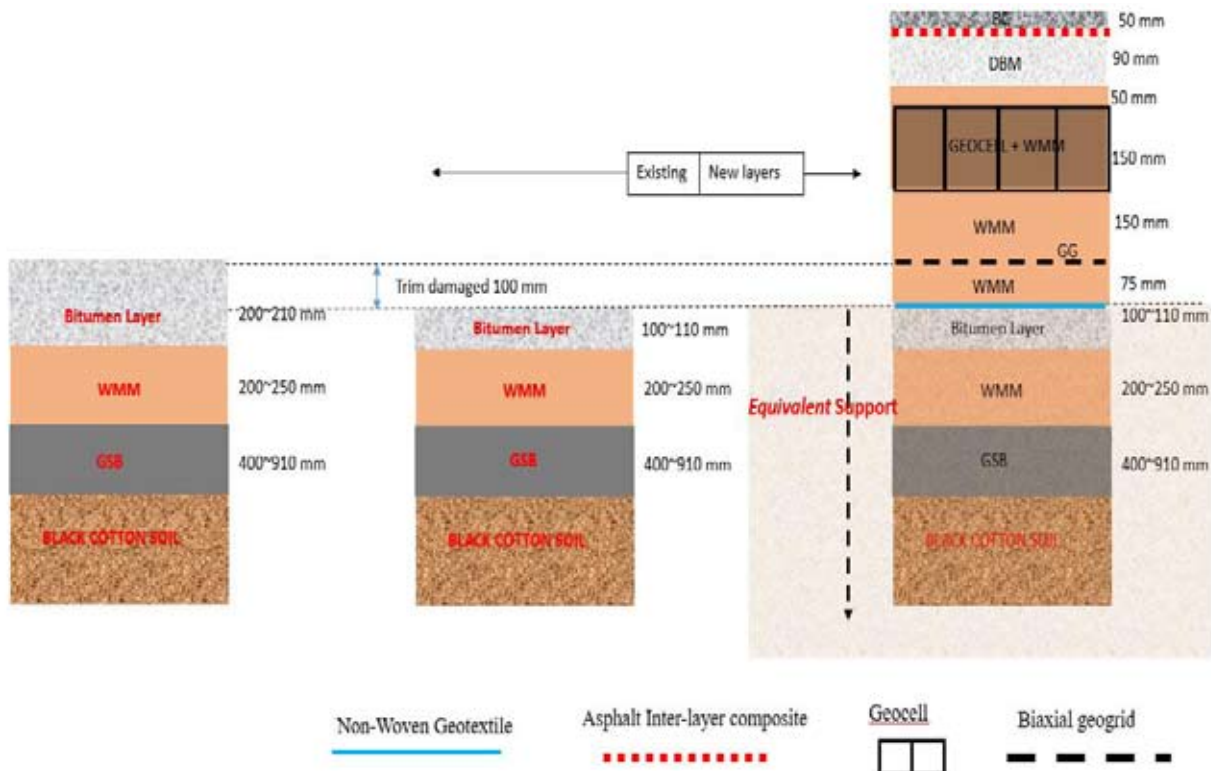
Possible design solution for pavement distressed at subgrade level
